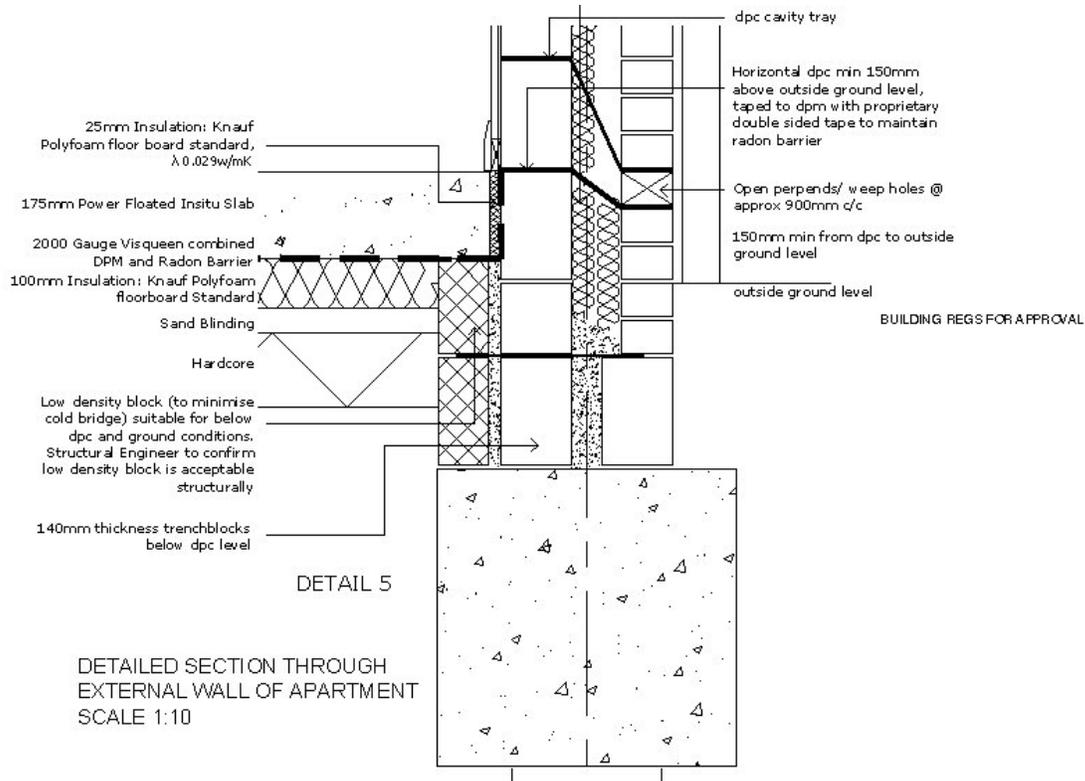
Ground floor slab detail – partial fill masonry site.
